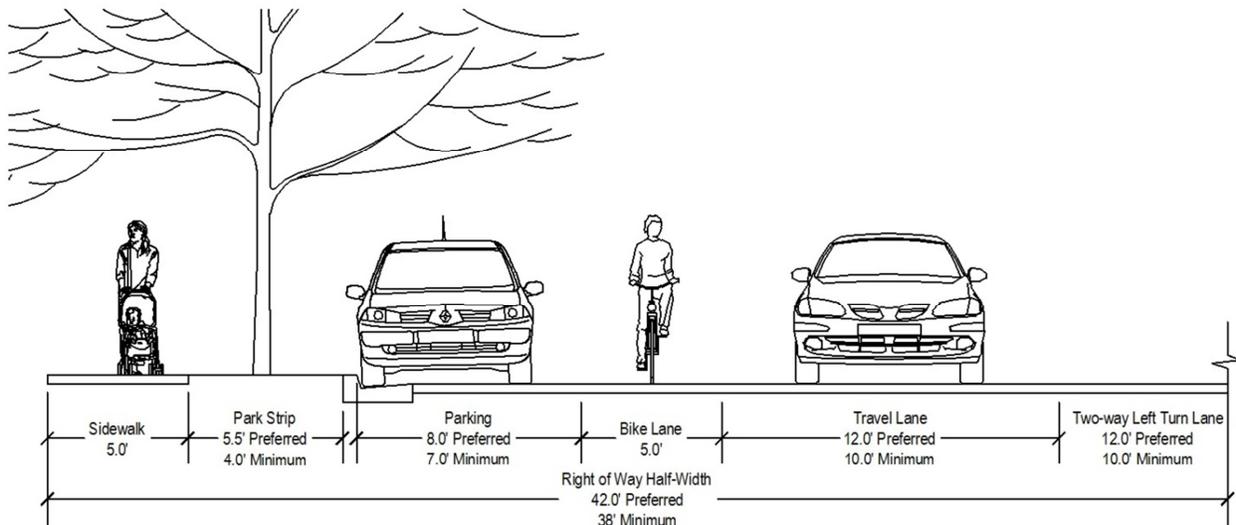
Class 2 Facility - Bike Lanes and Sidewalk
